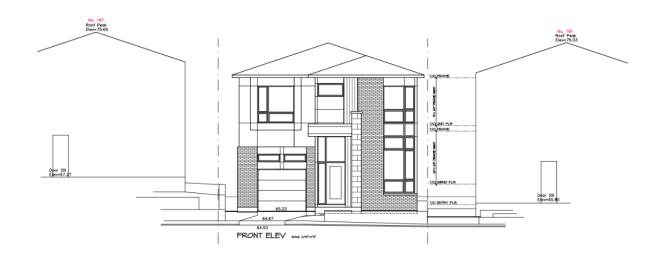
Front Elevation, prepared by David Bekkers M.A.A.T.O
